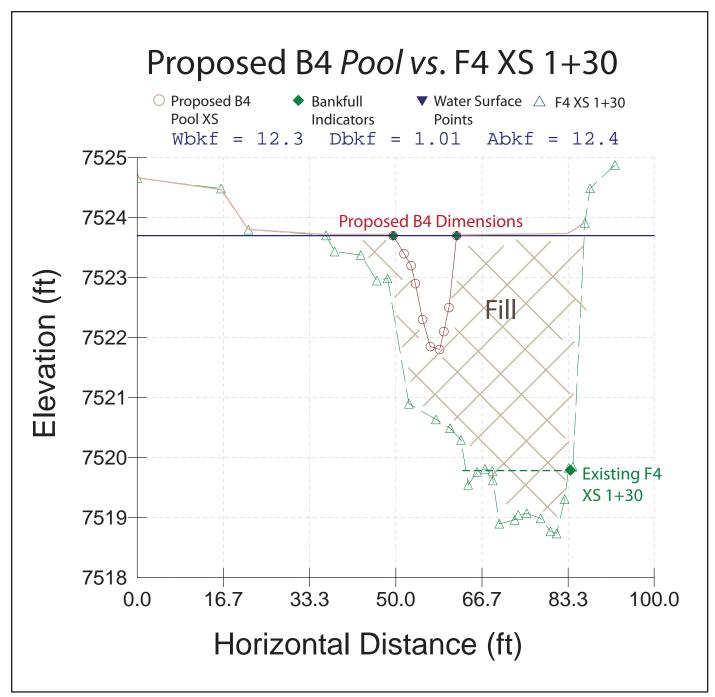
The proposed B4 *pool* cross-section compared to the existing F4 cross-section 1+30, indicating the substantial fill requirements and new bankfull elevation.
